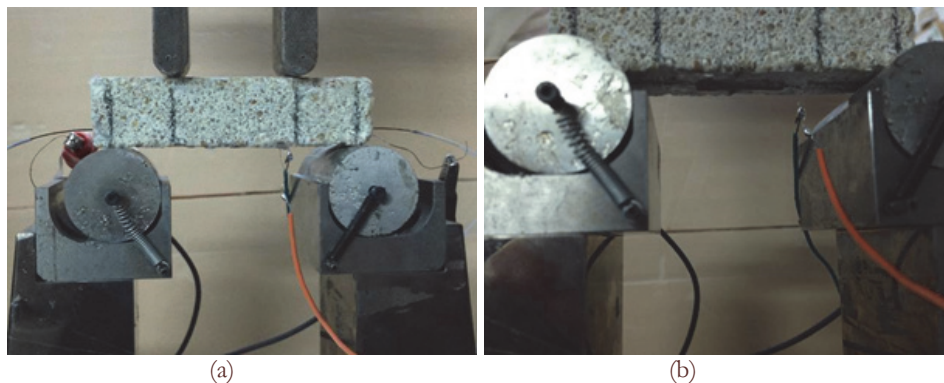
(a) Installed specimen with embedded PVA-CNT fiber and (b) magnification of the bottom side of the specimen with surface attached strain gauge.
